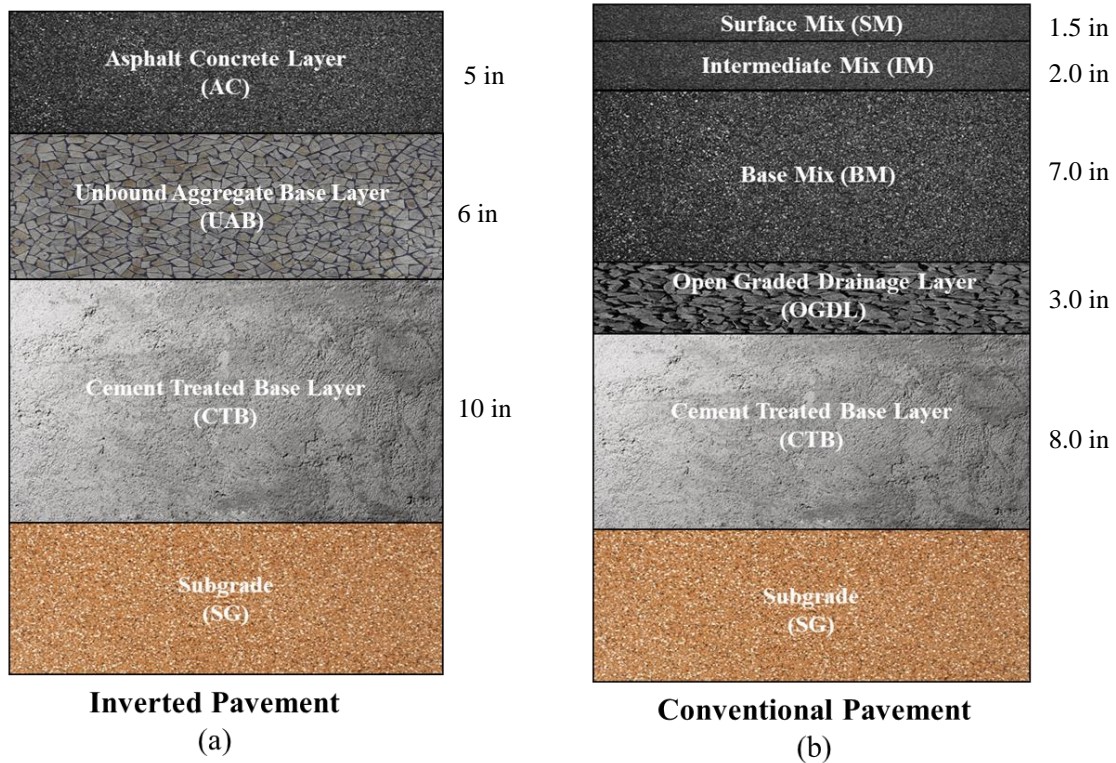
Layer configuration of the inverted pavement structure (a) and the conventional pavement structure (b) constructed at Bull Run Route 659.
